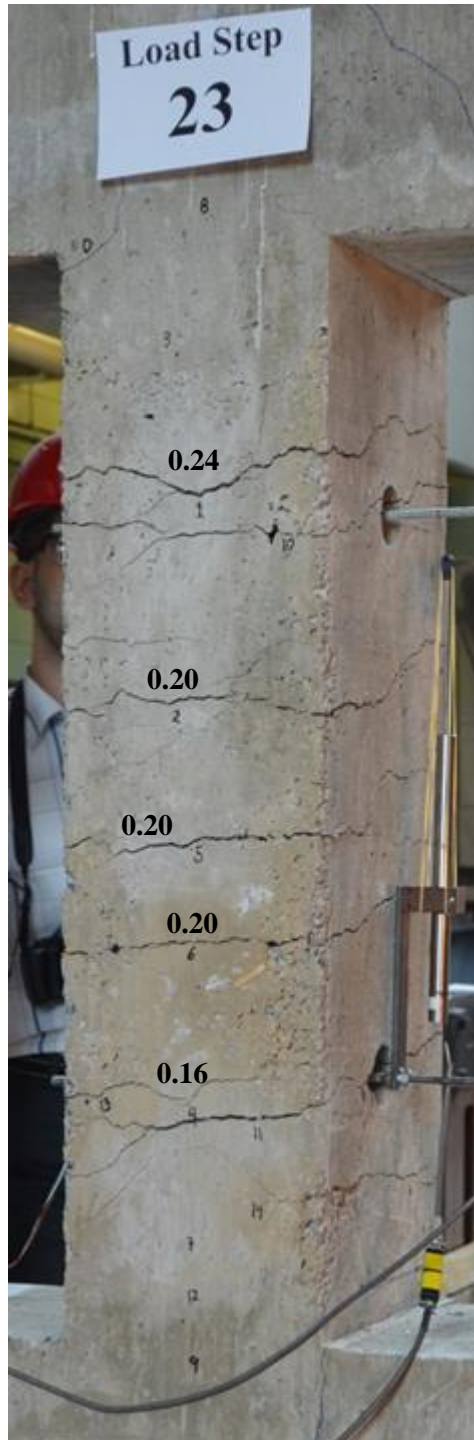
Cracks on north-west face of TS02 at Load Step 23
